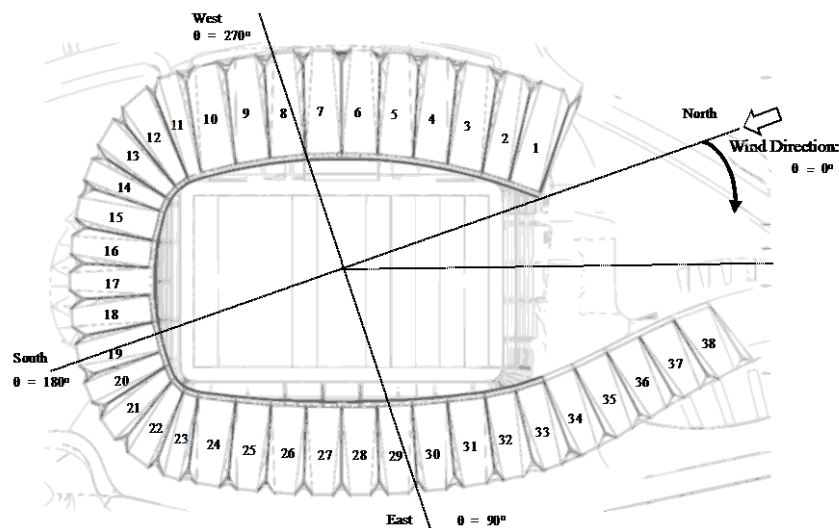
NQ Stadium roof layout diagram (as tested) and approach wind directions
